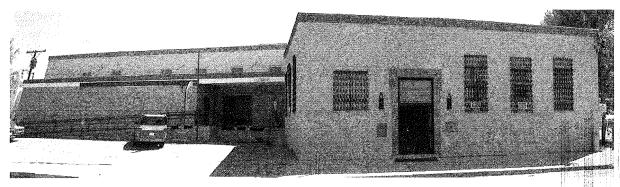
, 2017 View of North Elevation with office wing at right. (Note window to left of entry is a different proportion and has an exposed lintel and concrete sill, indicating it is an addition)
